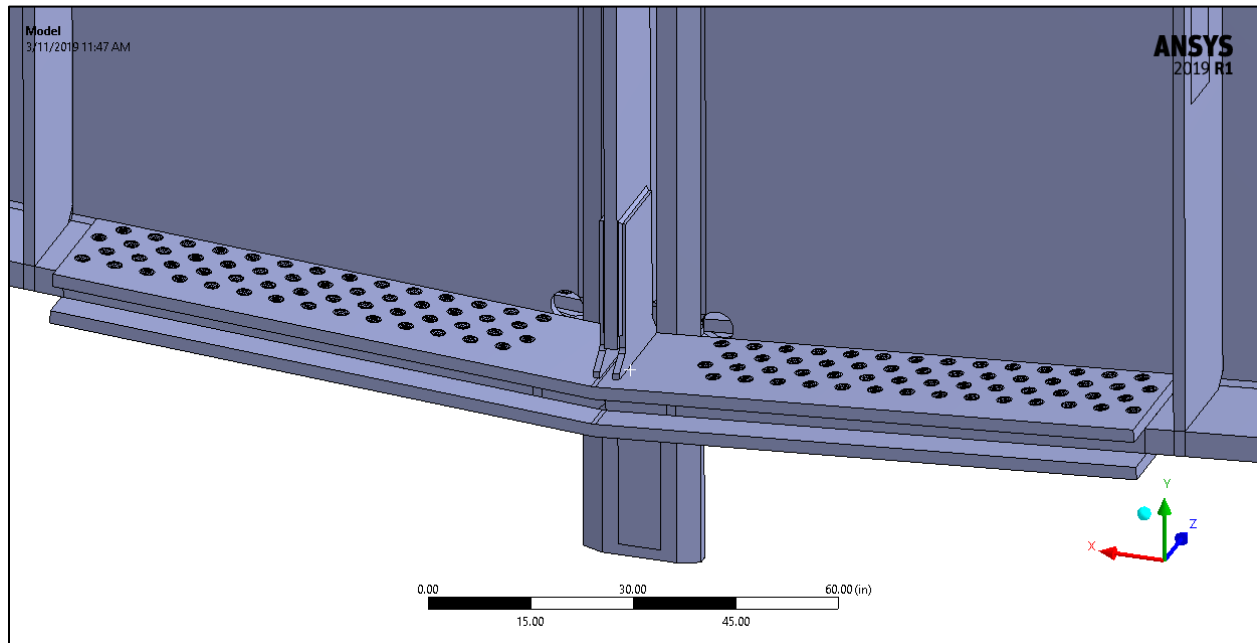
First Street South (“F”) reinforcement retrofit geometry.
